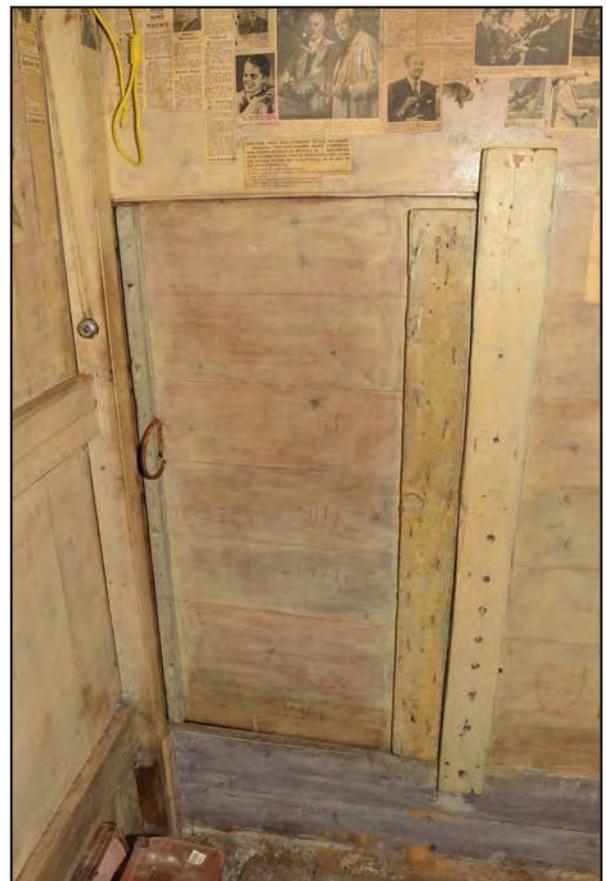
West side of elevation 7.1, door 7.1.005, looking north-northwest.
